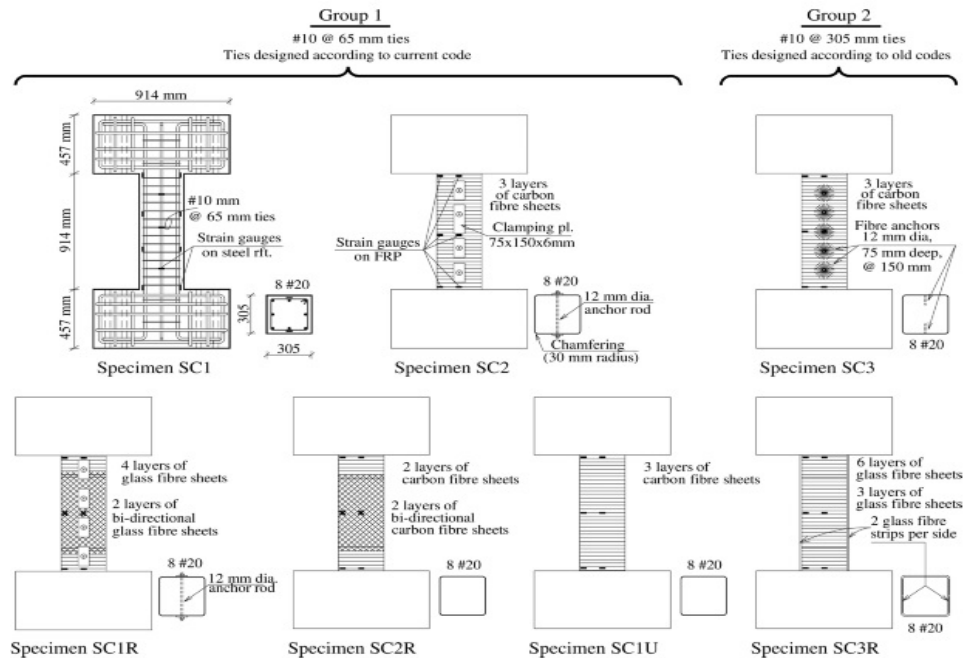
Dimensions, Details of Reinforcement and FRP Strengthening for the Specimens (Galal et al. 2005)
